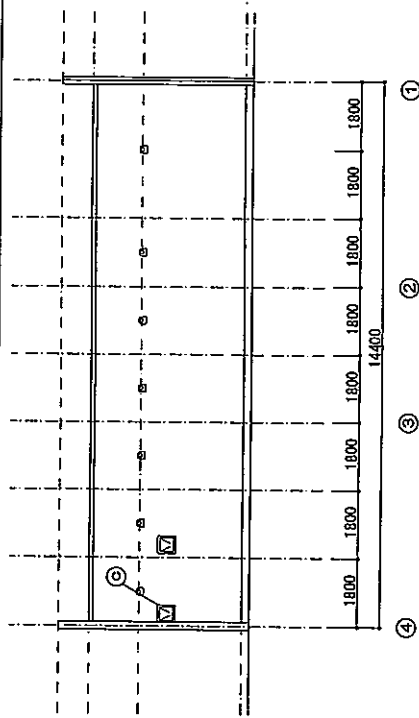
Elevation and Section of Community Fishery Centre Building
